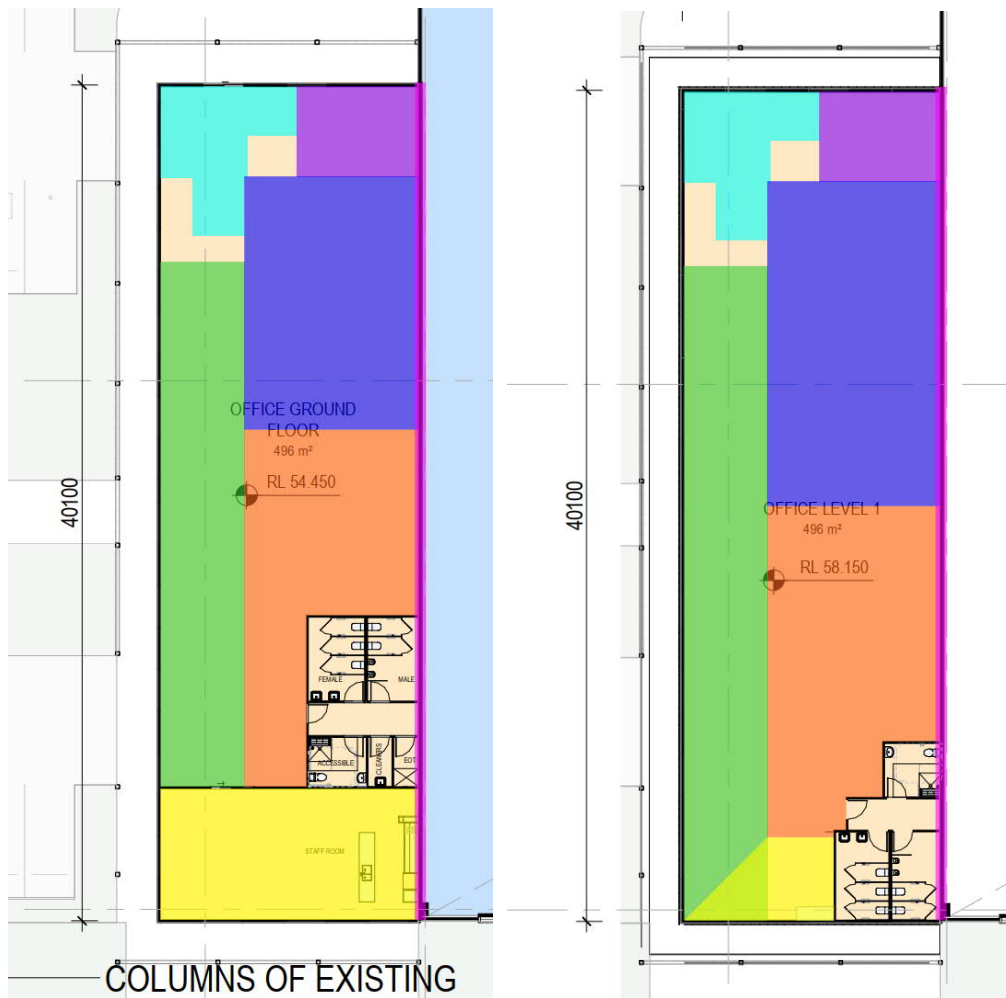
HVAC zones & thermal envelope for 1550 Centre Road Ground Floor (Left) and First Floor (Right)
